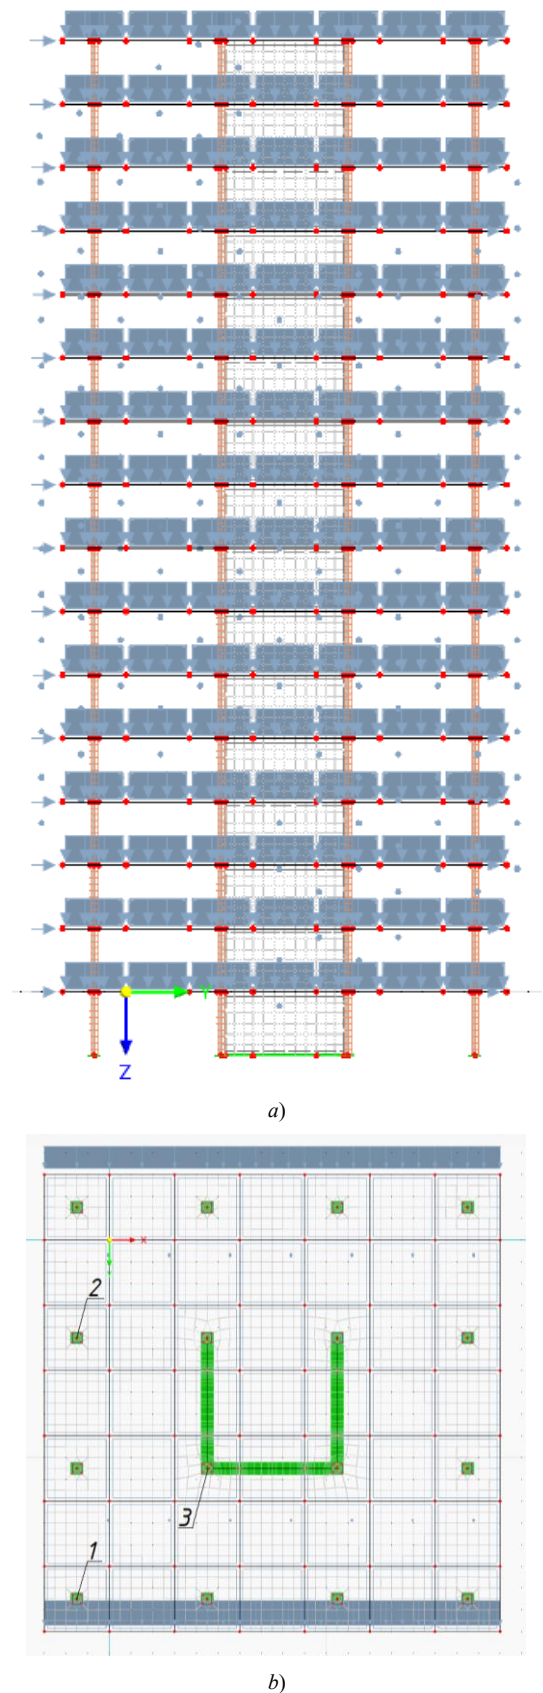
Model of a 16-story frame with flat plate floors: a) – view along the X axis; b) – top view; 1 – corner column under study; 2 – end column under study; 3 – middle column under study
